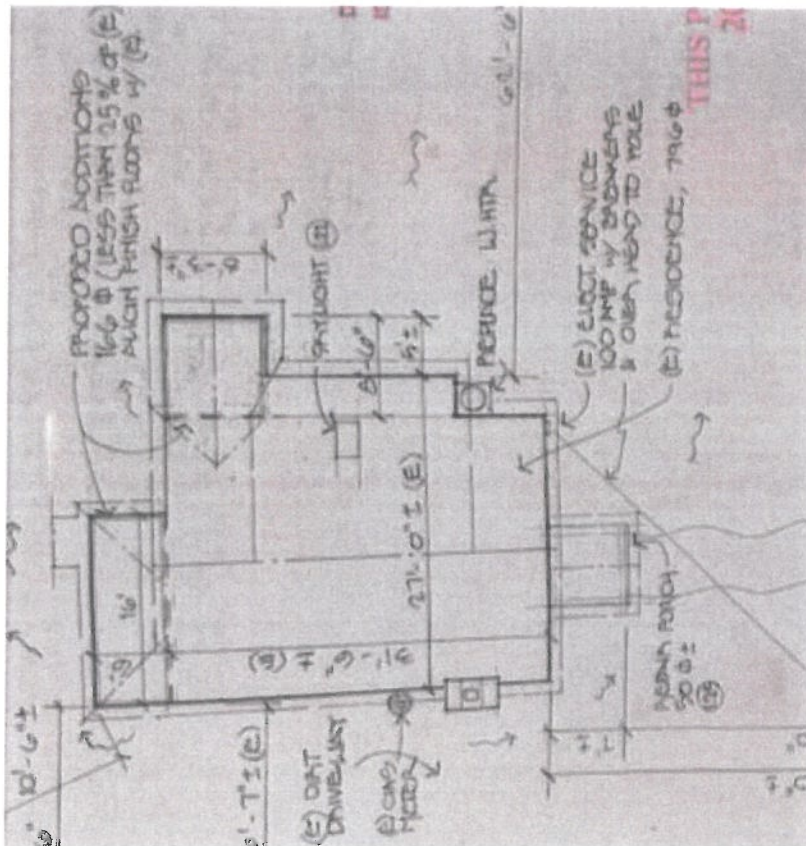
Detail from 2011 architectural plan for the proposed (2011) bathroom addition and remodel of the home located at 833 Maple St, Pacific Grove, CA 93950, APN: 006-634-050-000. Courtesy of the City of Pacific Grove Planning Division, 2019.
